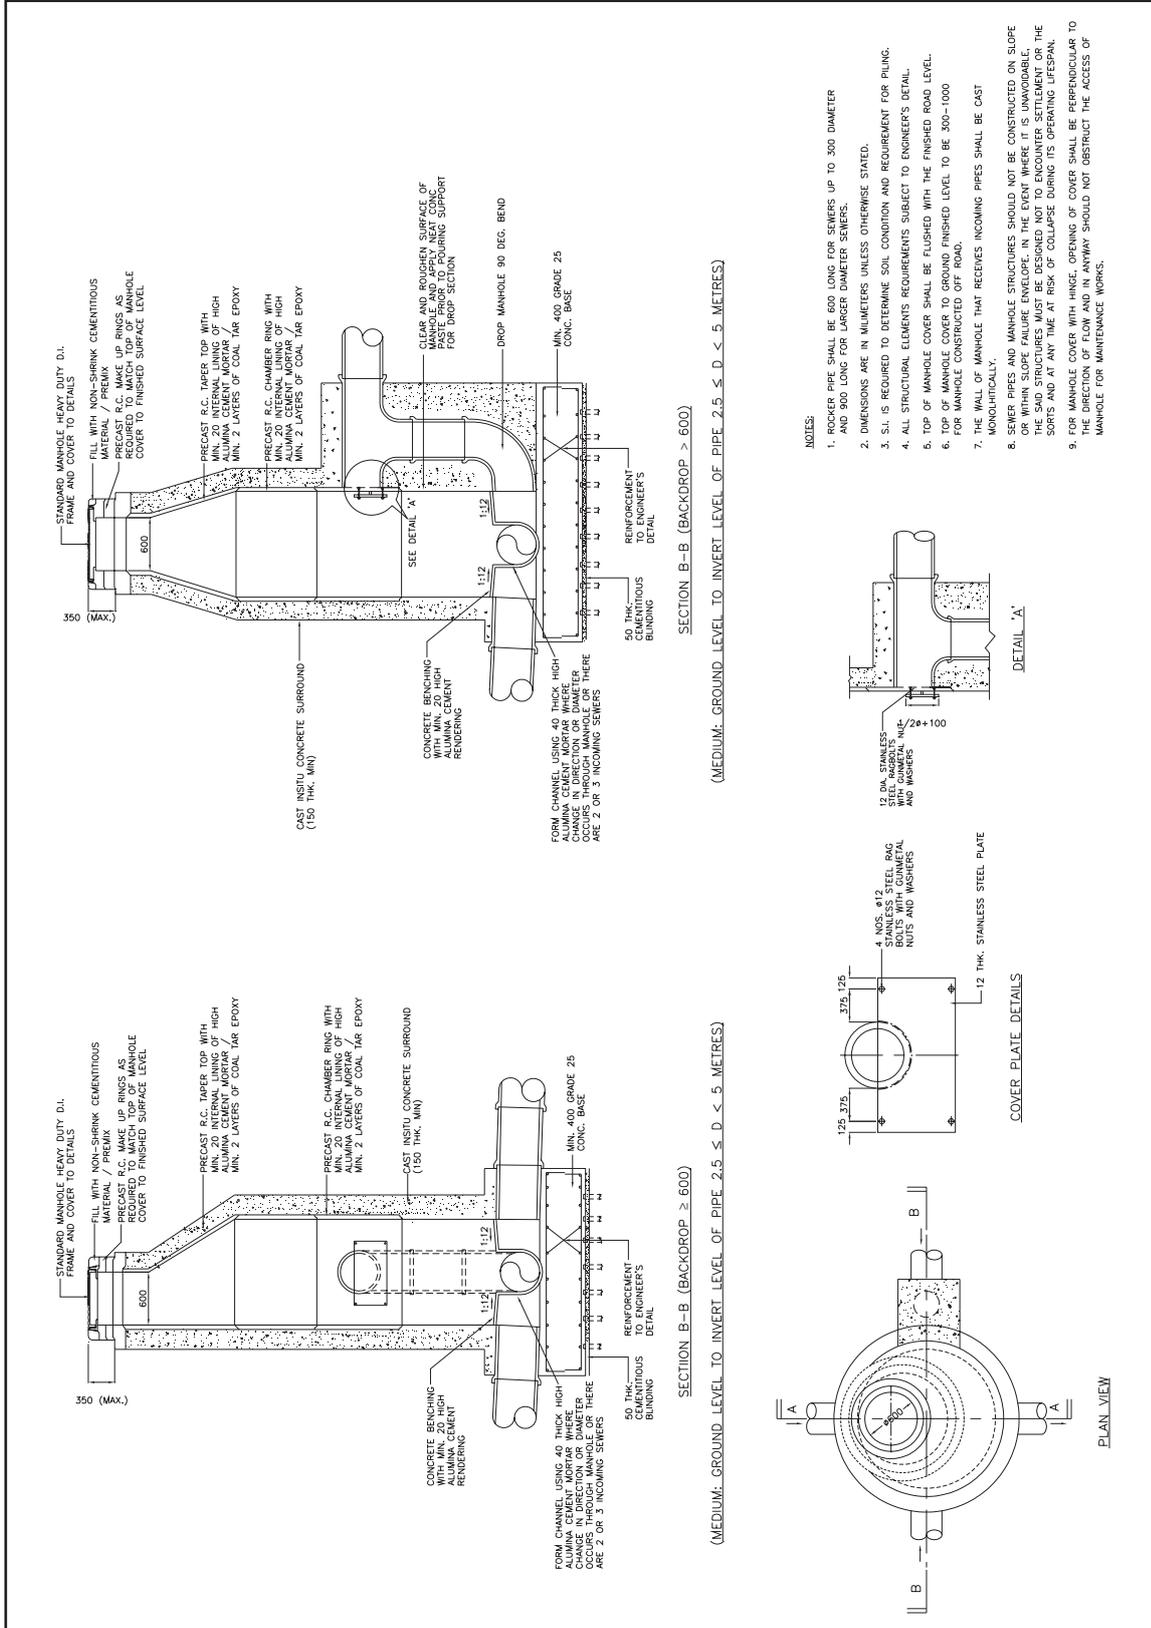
Typical Details of Large Diameter Manhole (LDM) Type
